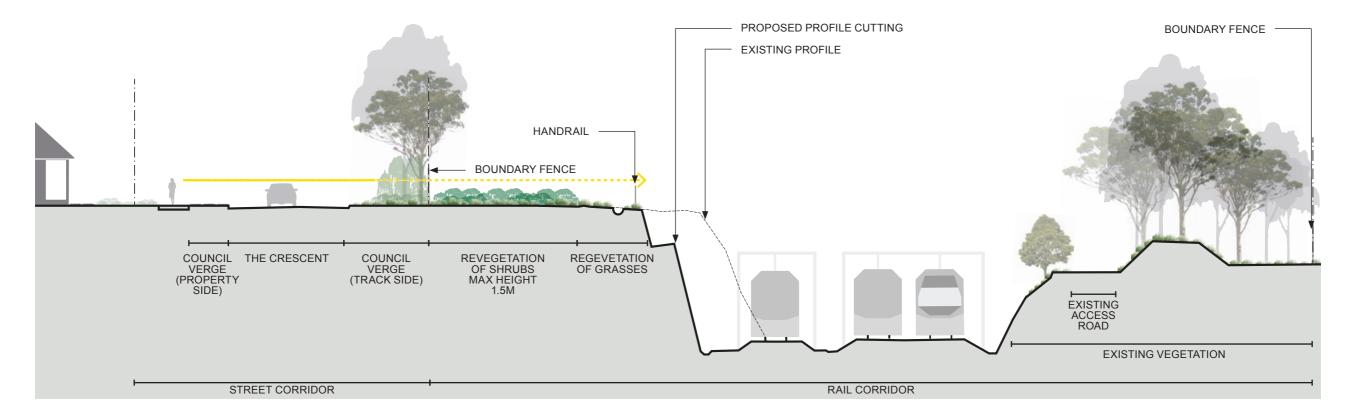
Typical cross section of tracks below street level and a cutting at The Crescent
